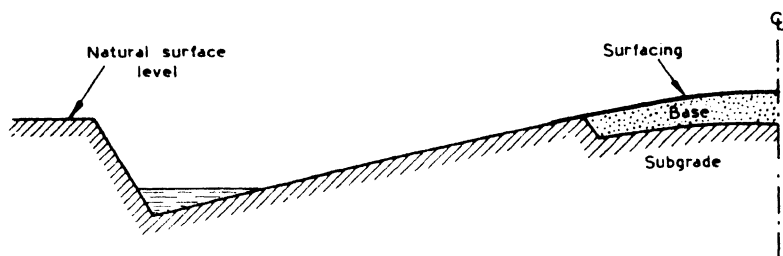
SECTION OF DRAINAGE DITCH FOR SOIL ROAD
